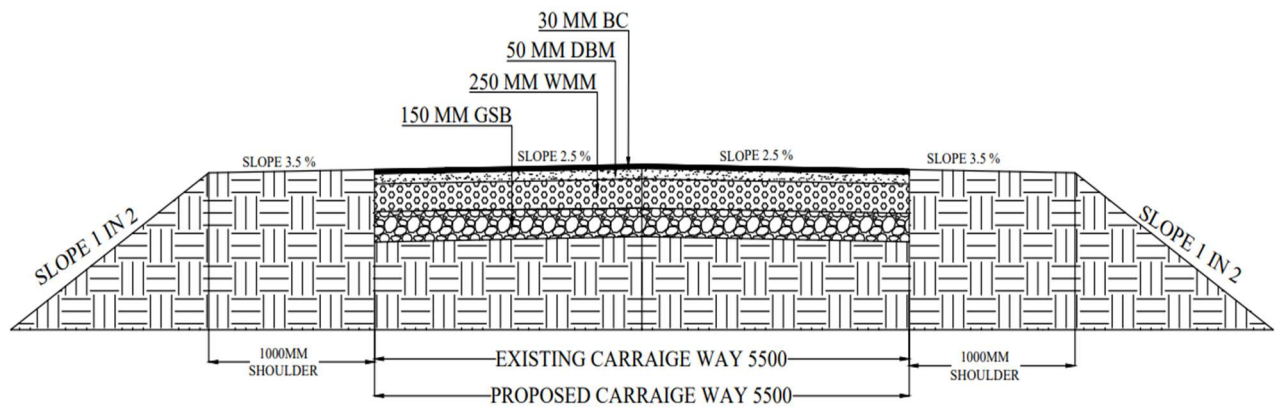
Typical Cross Section of pavement for scrap tyre modified subgrade of CBR 8.90
